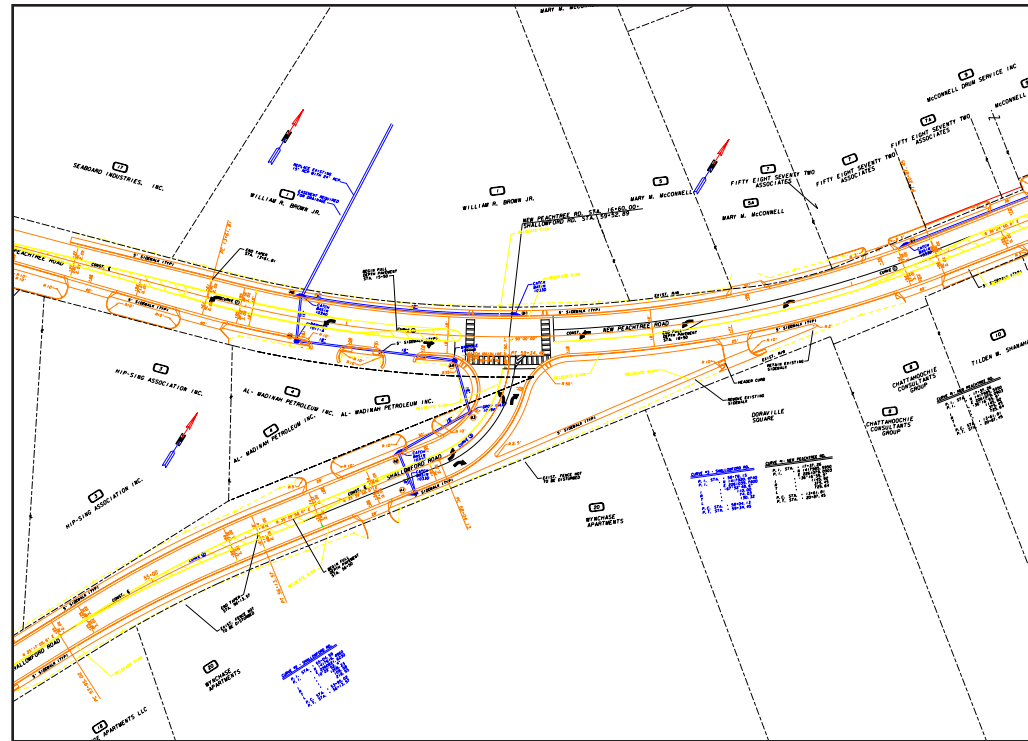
Shallowford Road and New Peachtree Road intersection design concept
